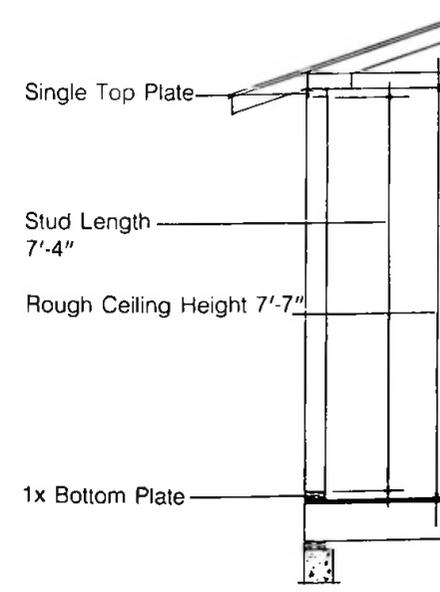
Wall construction for a 7'-6" finished ceiling height with studs vertically aligned over other framing members, permitting single top plate.
